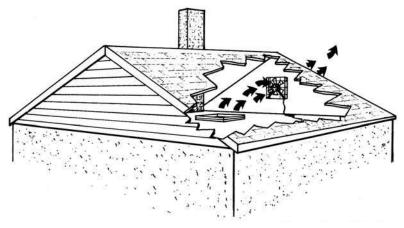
Fan mounted at the attic window with the ceiling opening in central hallway. (Courtesy Hayes-Albion Corp.)
